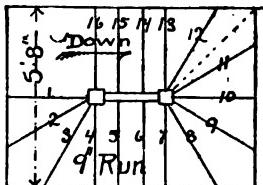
Plan for Stairs for Limited Space. "Dog-Legged" Stairs.
